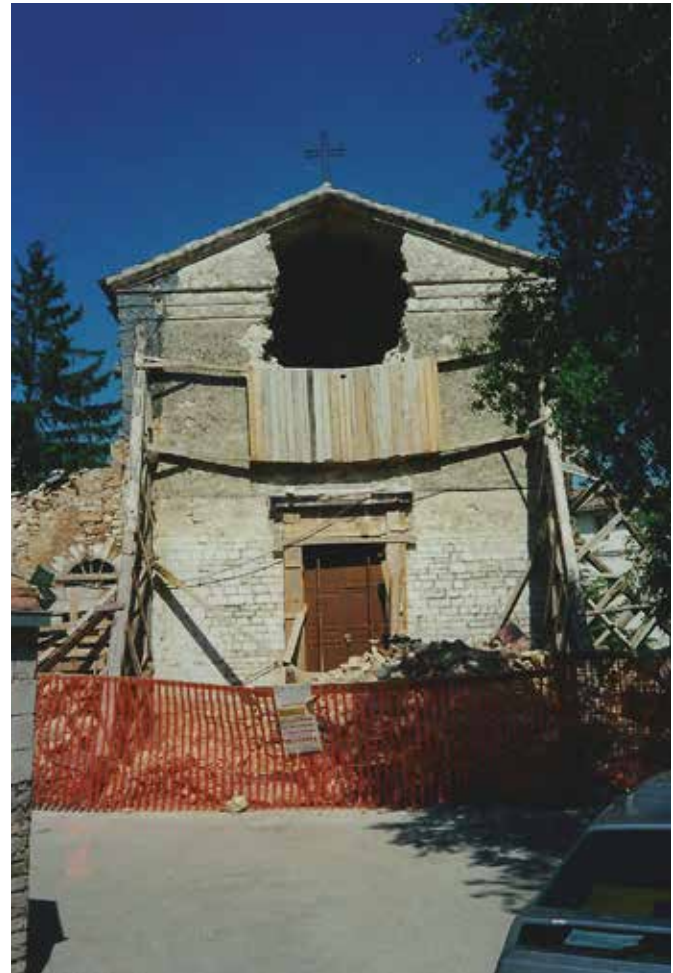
Collapse of the central part of a slender wall (house, Umbria, Italy) / photo: R. v. Hees
